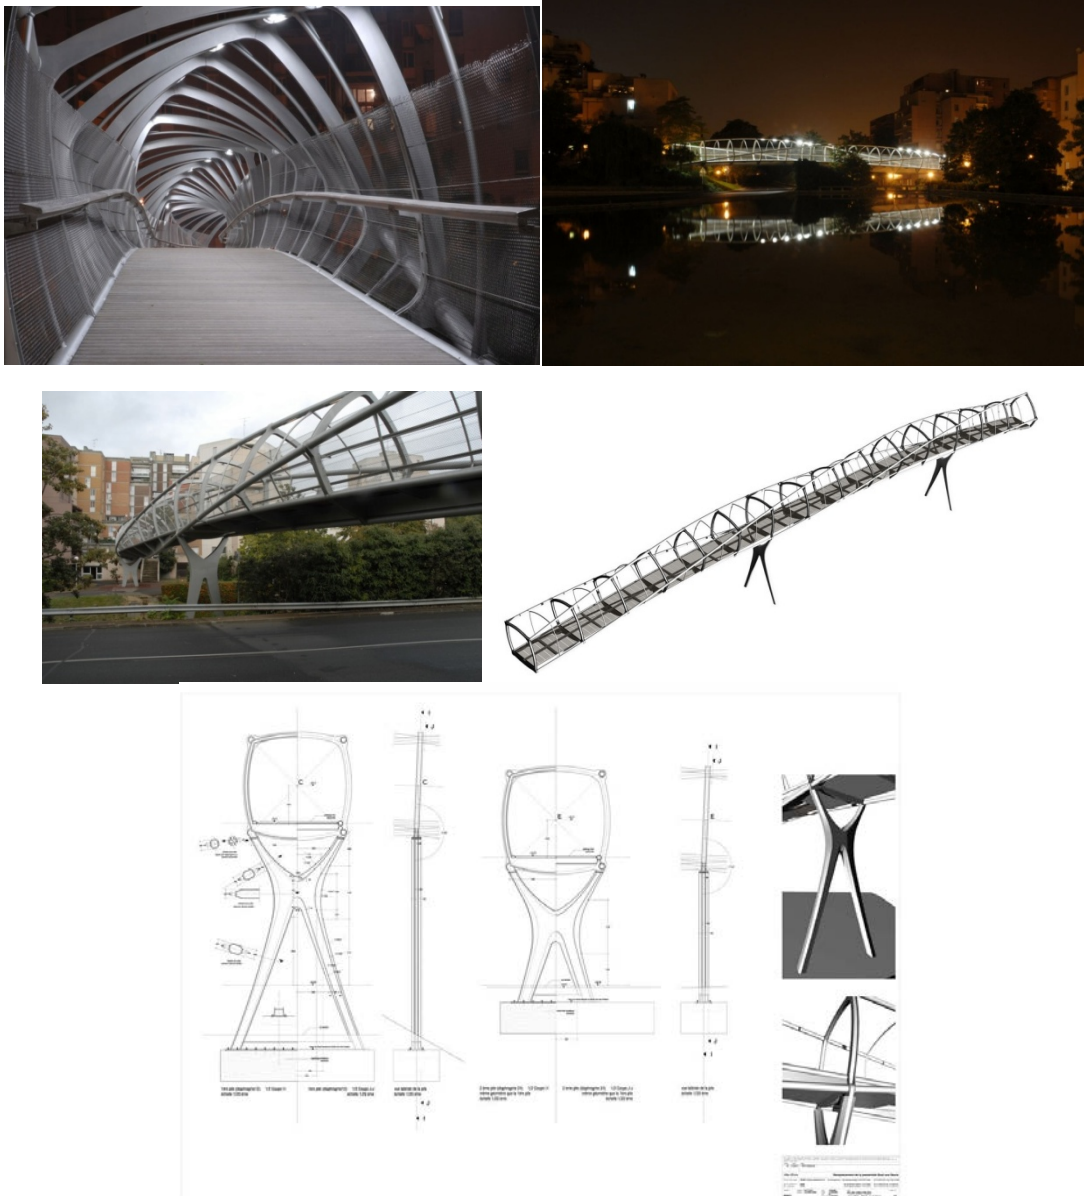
Arganzuela Footbridge in Madrid (pictures from [9]).
